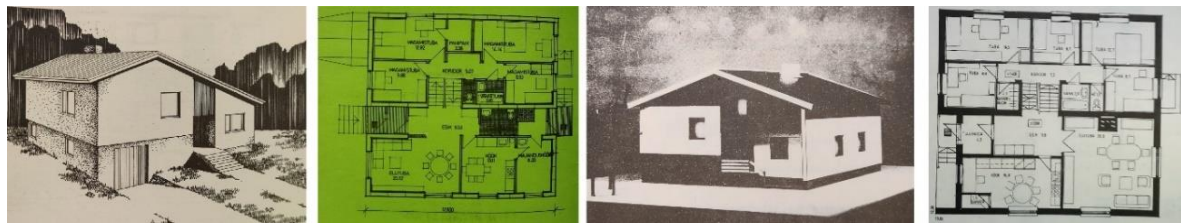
Examples of the Toomas series, (left to right: Toomas-5, visualization and floor plan (PI EKE Projekt, n.d.-k); Toomas 131, visualization and floor plan (PI EKE Projekt, n.d.-l))
